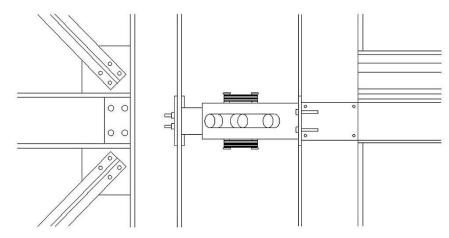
Schematic detail of SMAD connecting the existing building with the exoskeleton.
